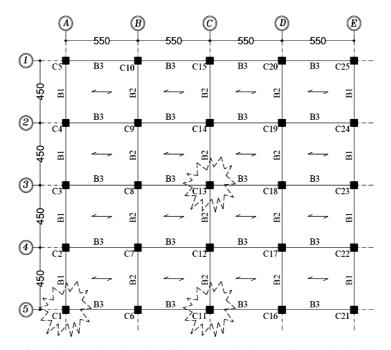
Structural configuration and numbering of beams and columns for sample buildings (length in cm)
